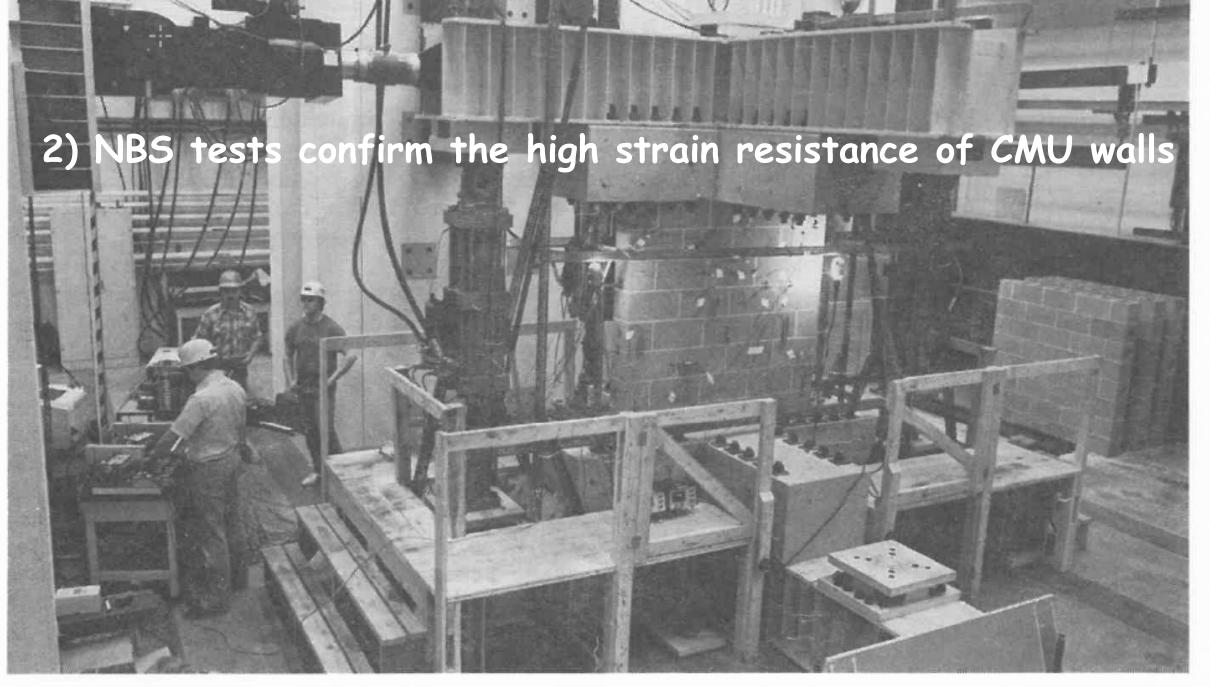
In-place 5- by 5-ft masonry block wall at NBS Tridirectional Test Facility.
